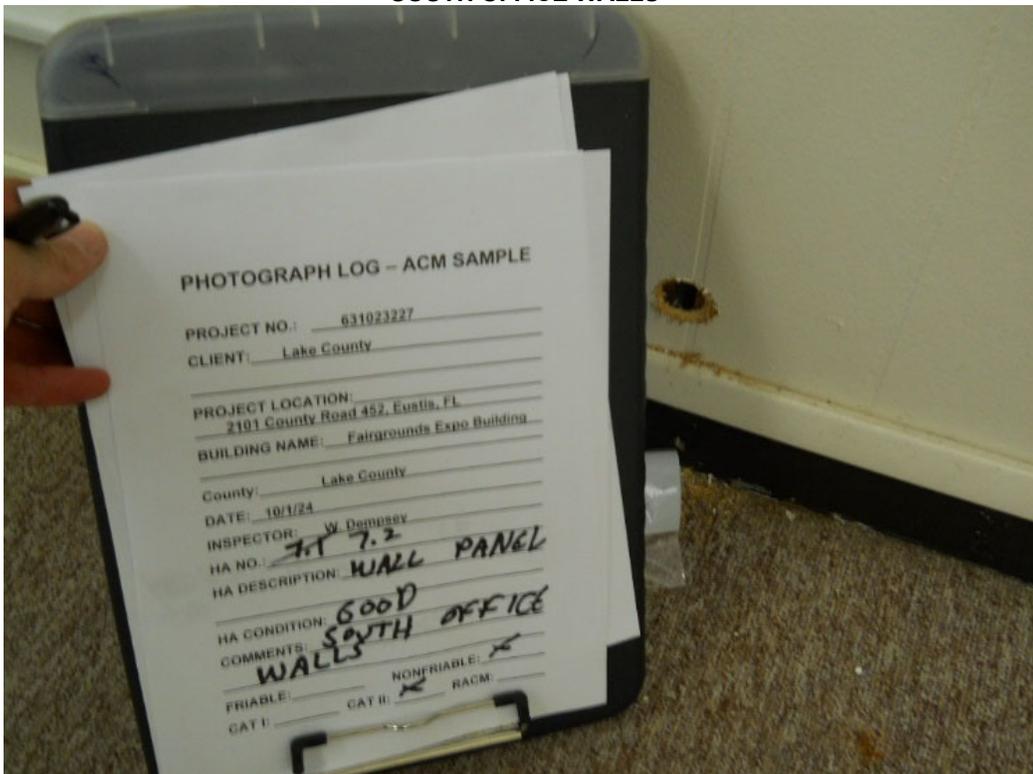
10/1/24 – SAMPLE 7.2 – HA 7
